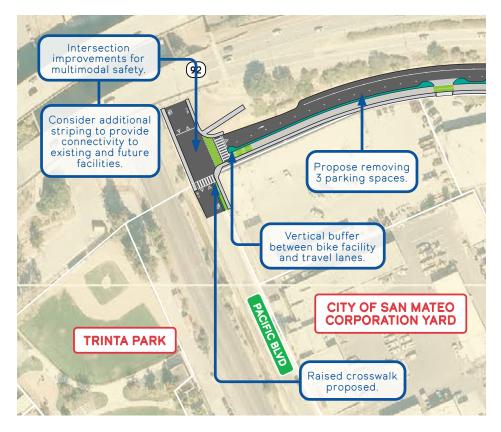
B PACIFIC BOULEVARD INTERSECTION CONCEPT PLAN
